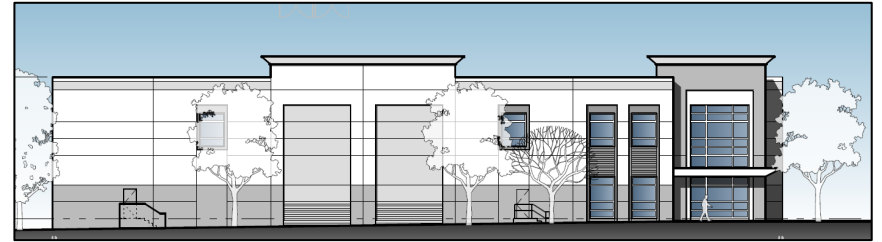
EXHIBIT C—BUILDING 2 NORTH ELEVATION REVISION COMPARISON
